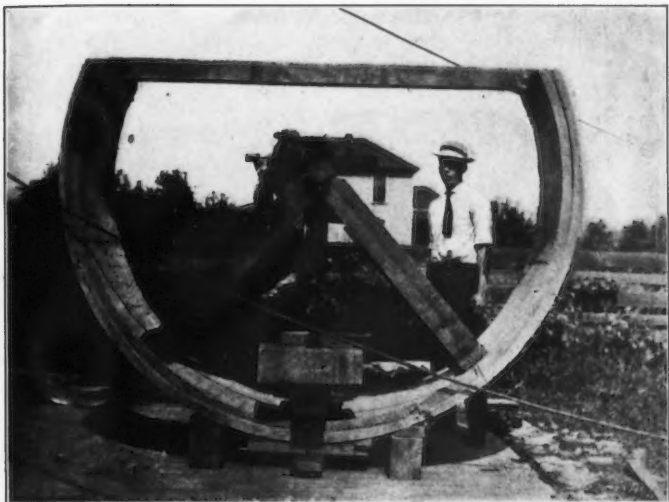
TESTING SECTION, SHOWING METHOD OF APPLYING INTERIOR PRESSURE.
